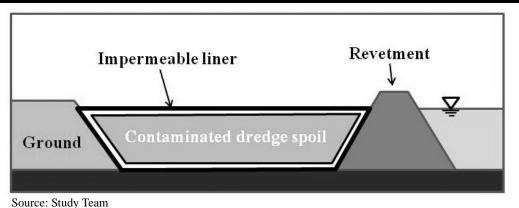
Cross-section image of impermeable confined disposal facility
